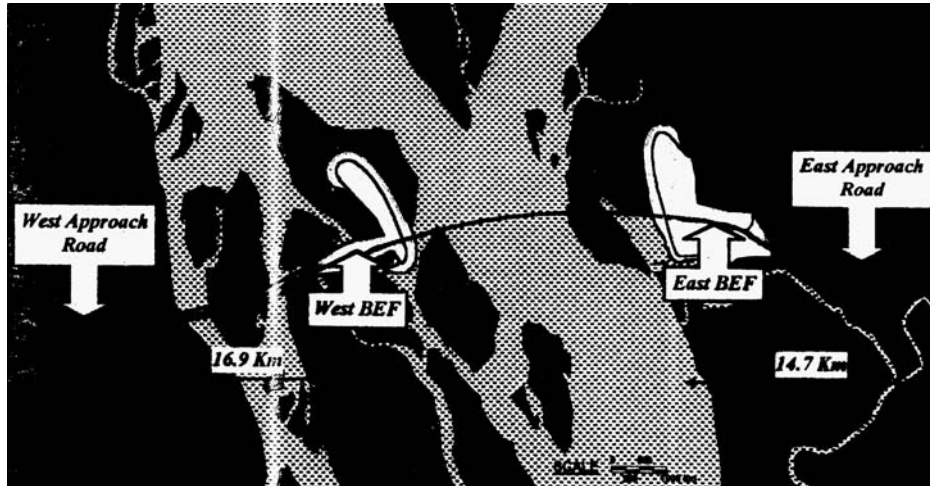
(a) Jamuna Bridge: General Layout
